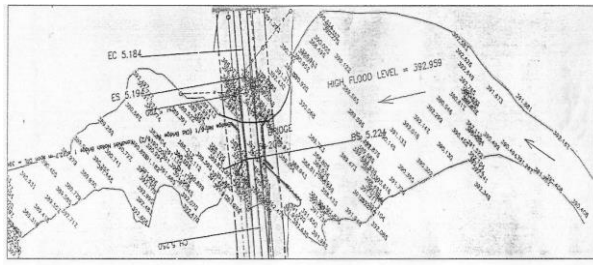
Formation of a Bowl upstream and downstream of a Bridge in a State Highway in M.P. The Bridge is likely to be outflanked
